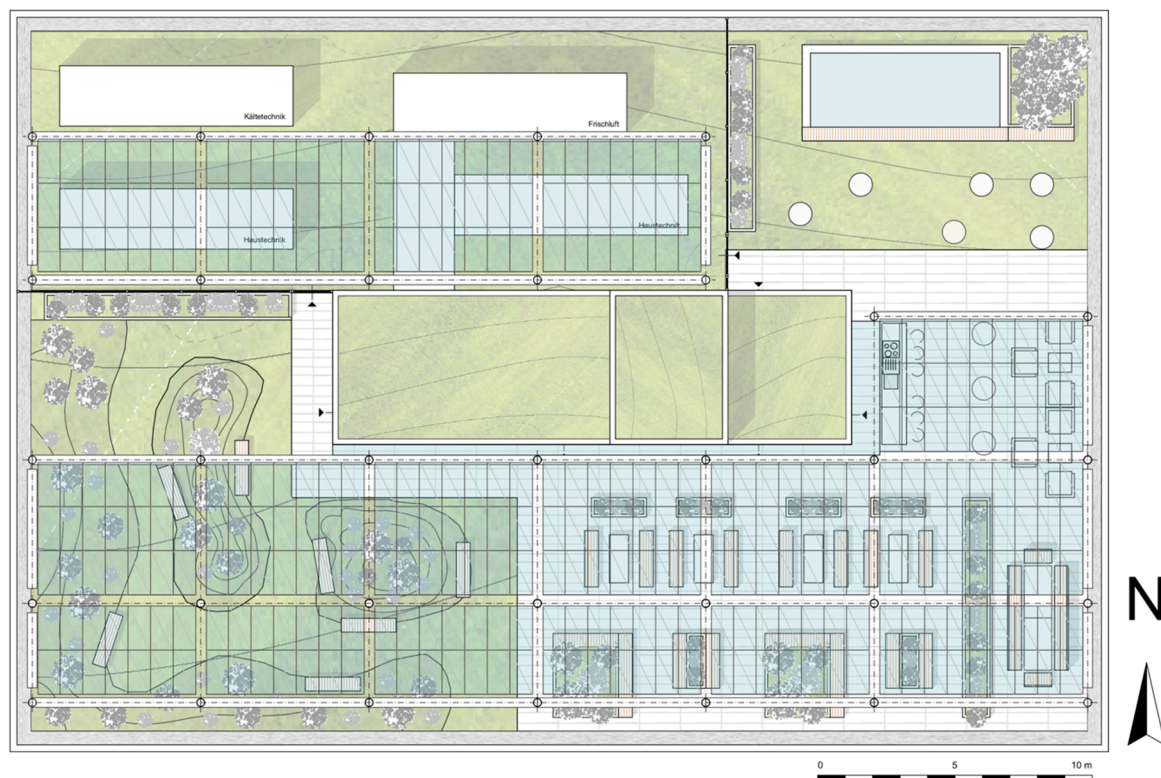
Exemplary floor plan (rooftop view) for the open-plan office type.
